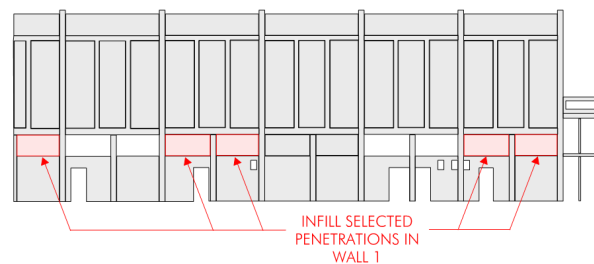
Improve the Stiffness of Wall 1 via Reinforced Concrete Infill Walls
